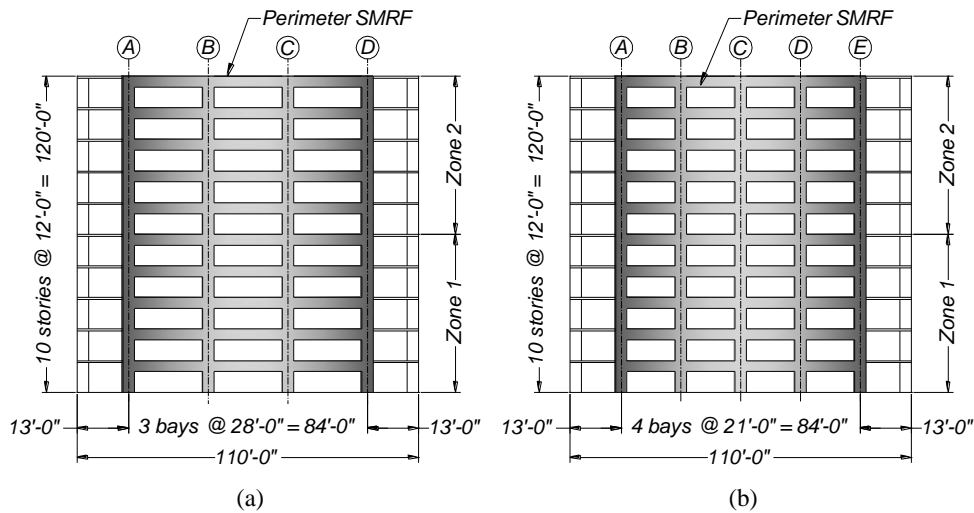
Elevation of 10-story archetype buildings: (a) A10-3 and (b) A10-4.
